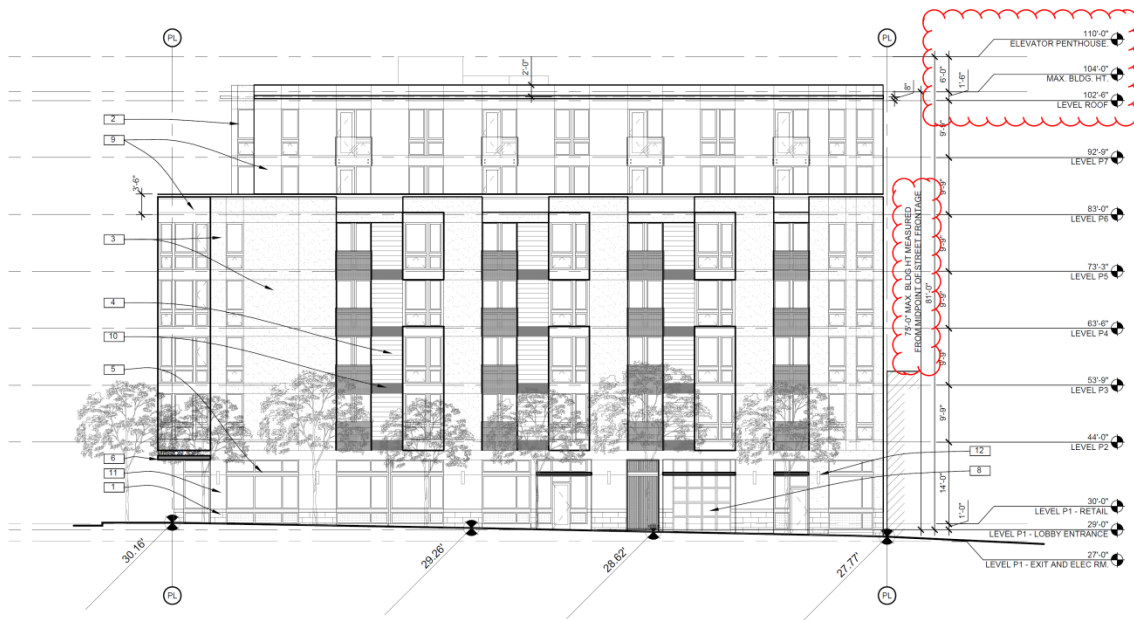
Proposed Project 19th Street Elevation (South Elevation)
